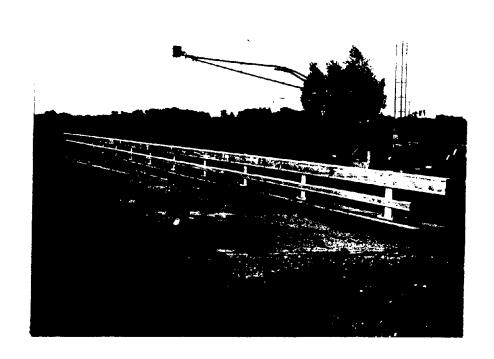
Photographs of test installation for 471470-18 and 471470-19.
